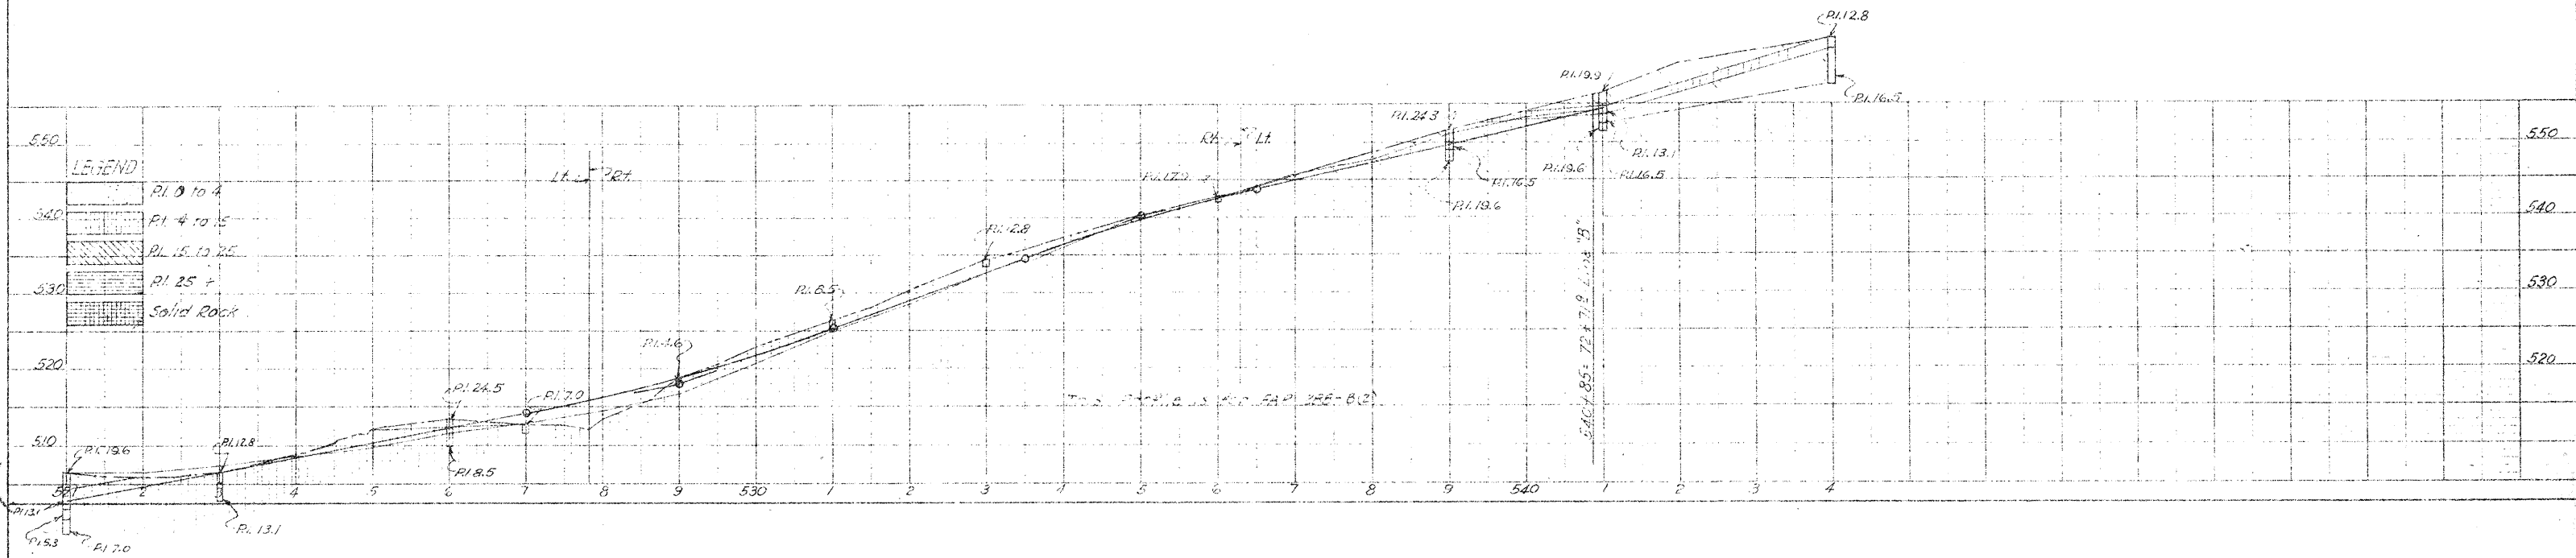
DETAILS OF CONCRETE PAVEMENT AT SOUTH END OF
